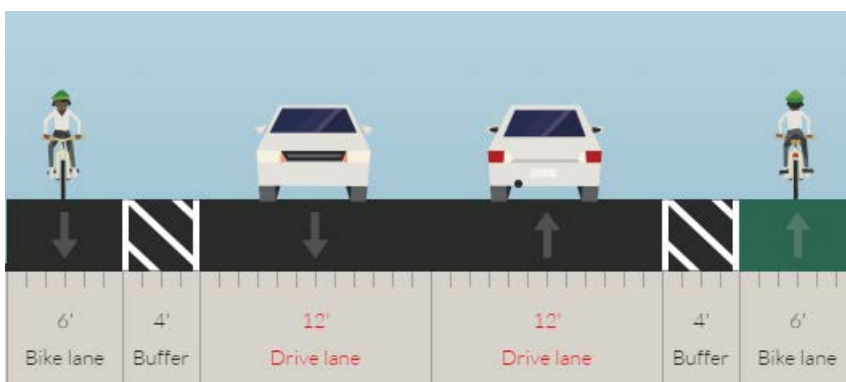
Proposed road cross-section for County Road 1013 and FM 1745
